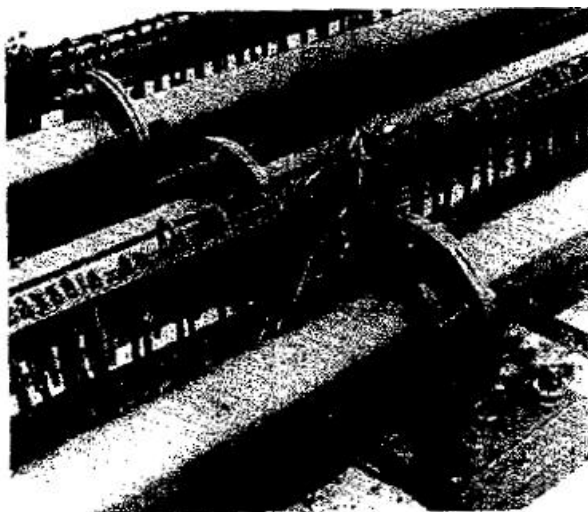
Intermediate connections between frames of the prestressing system for continuous beams (Nawy et al.).
